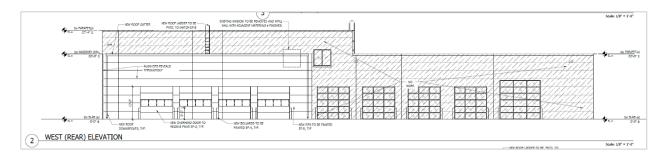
Proposed rear elevation rear facing Briggs Chaney Blvd.
